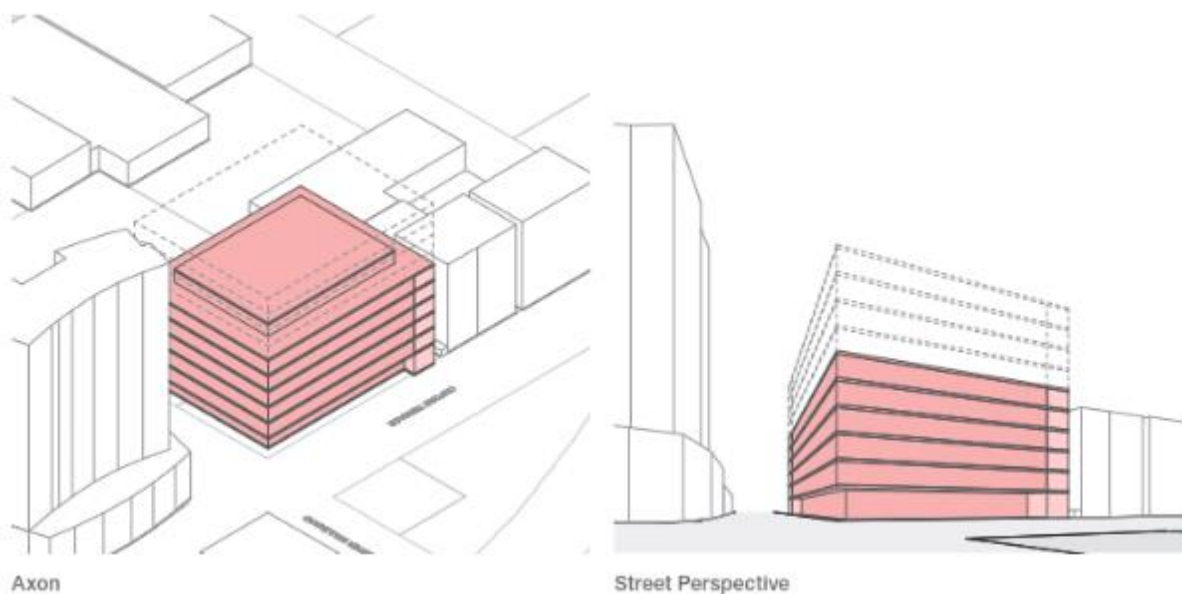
Modelling of the road wall height illustrating integration with existing building heights.
